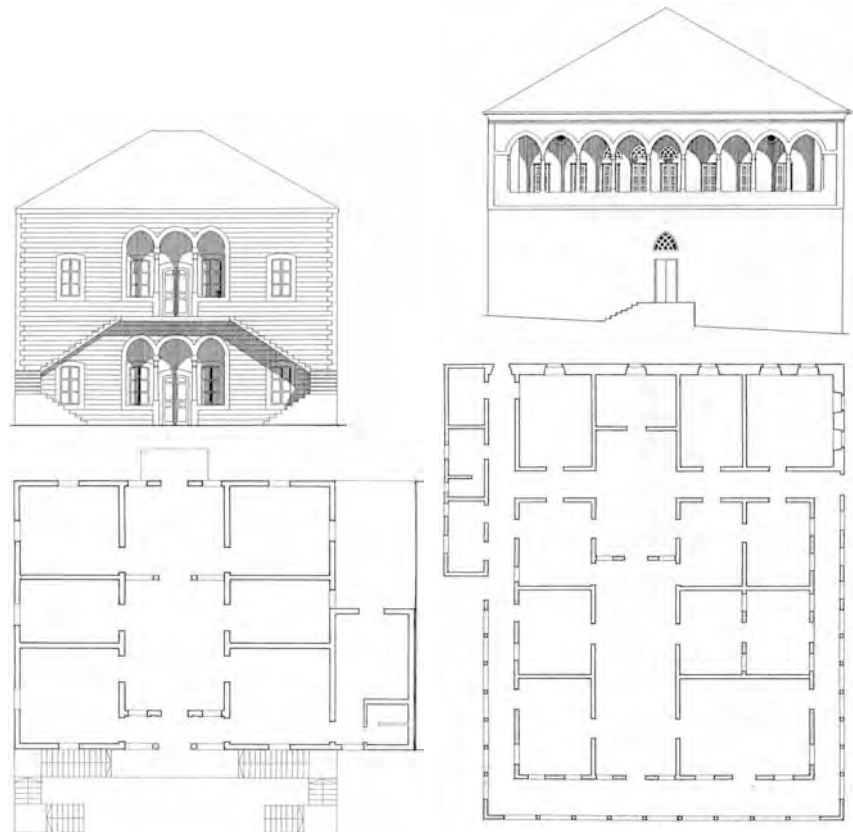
4 Tzionut Ave. Plan of first floor and elevation. Used as a youth club.
